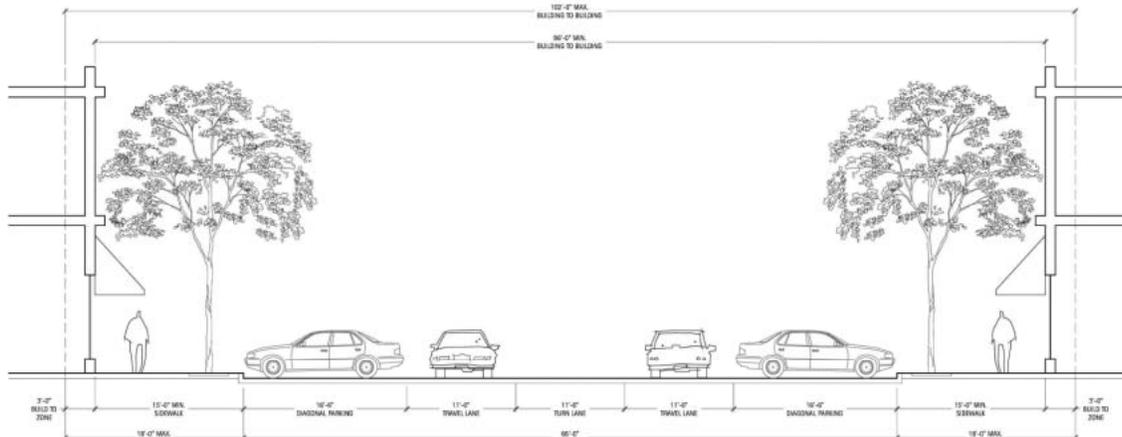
Section of Typical Toft Avenue Roadway Section in TC District
